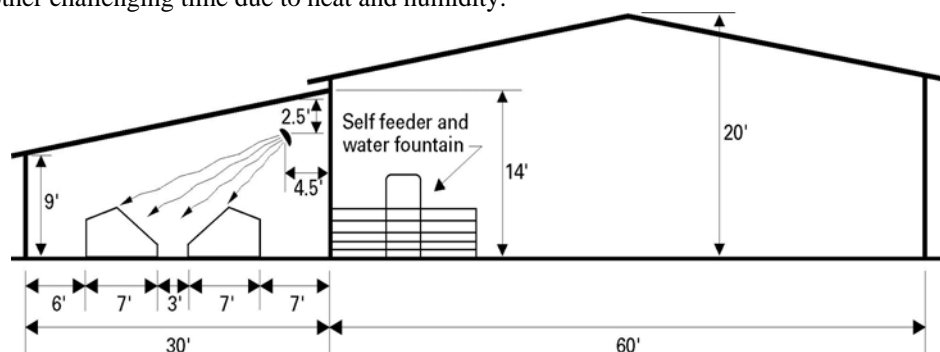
Alternative farrowing building at ISU Allee Farm, Newell, IA.
